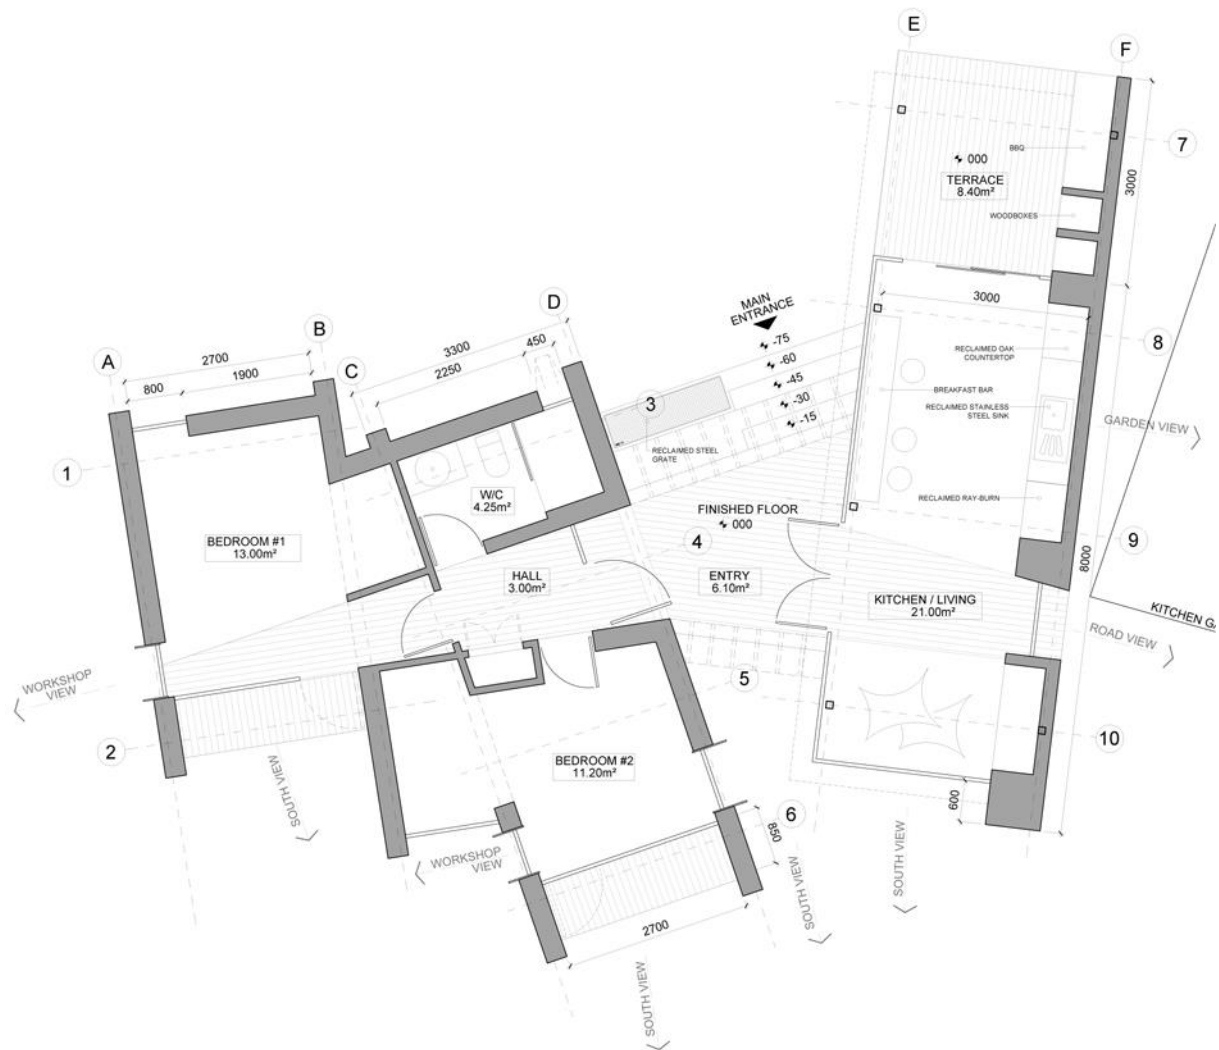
The floor plan of Student Lodge 3. The layout of the building is defined by views and levels of privacy.
